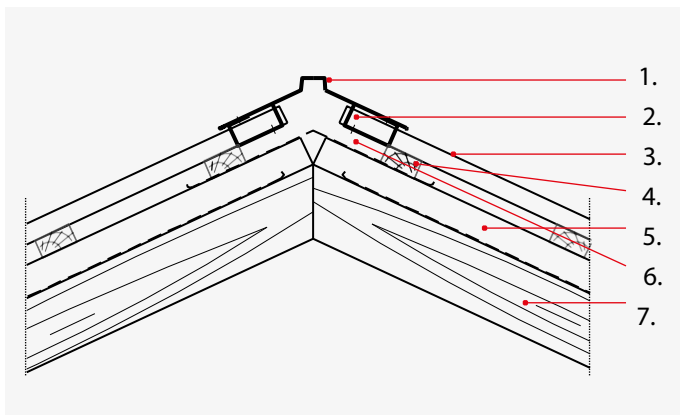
ROOF CROSS-SECTION ACROSS THE RIDGE
